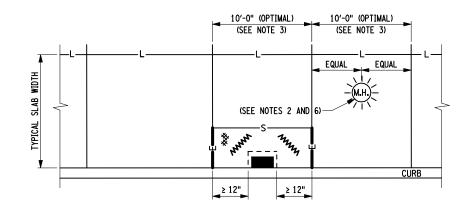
DETAIL "D" - SINGLE SLAB ISOLATION (EXPOSED TO TRAFFIC CONDITION SHOWN - SEE NOTE 4)
